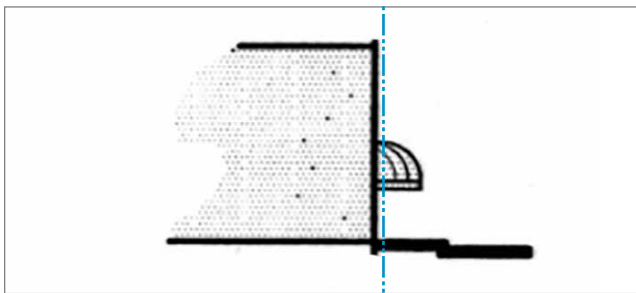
Shopfront & Awning. A facade aligned close to the frontage line with the entrance at sidewalk grade. This type is conventional for retail frontage. It is commonly equipped with cantilevered shed roof or an awning.
